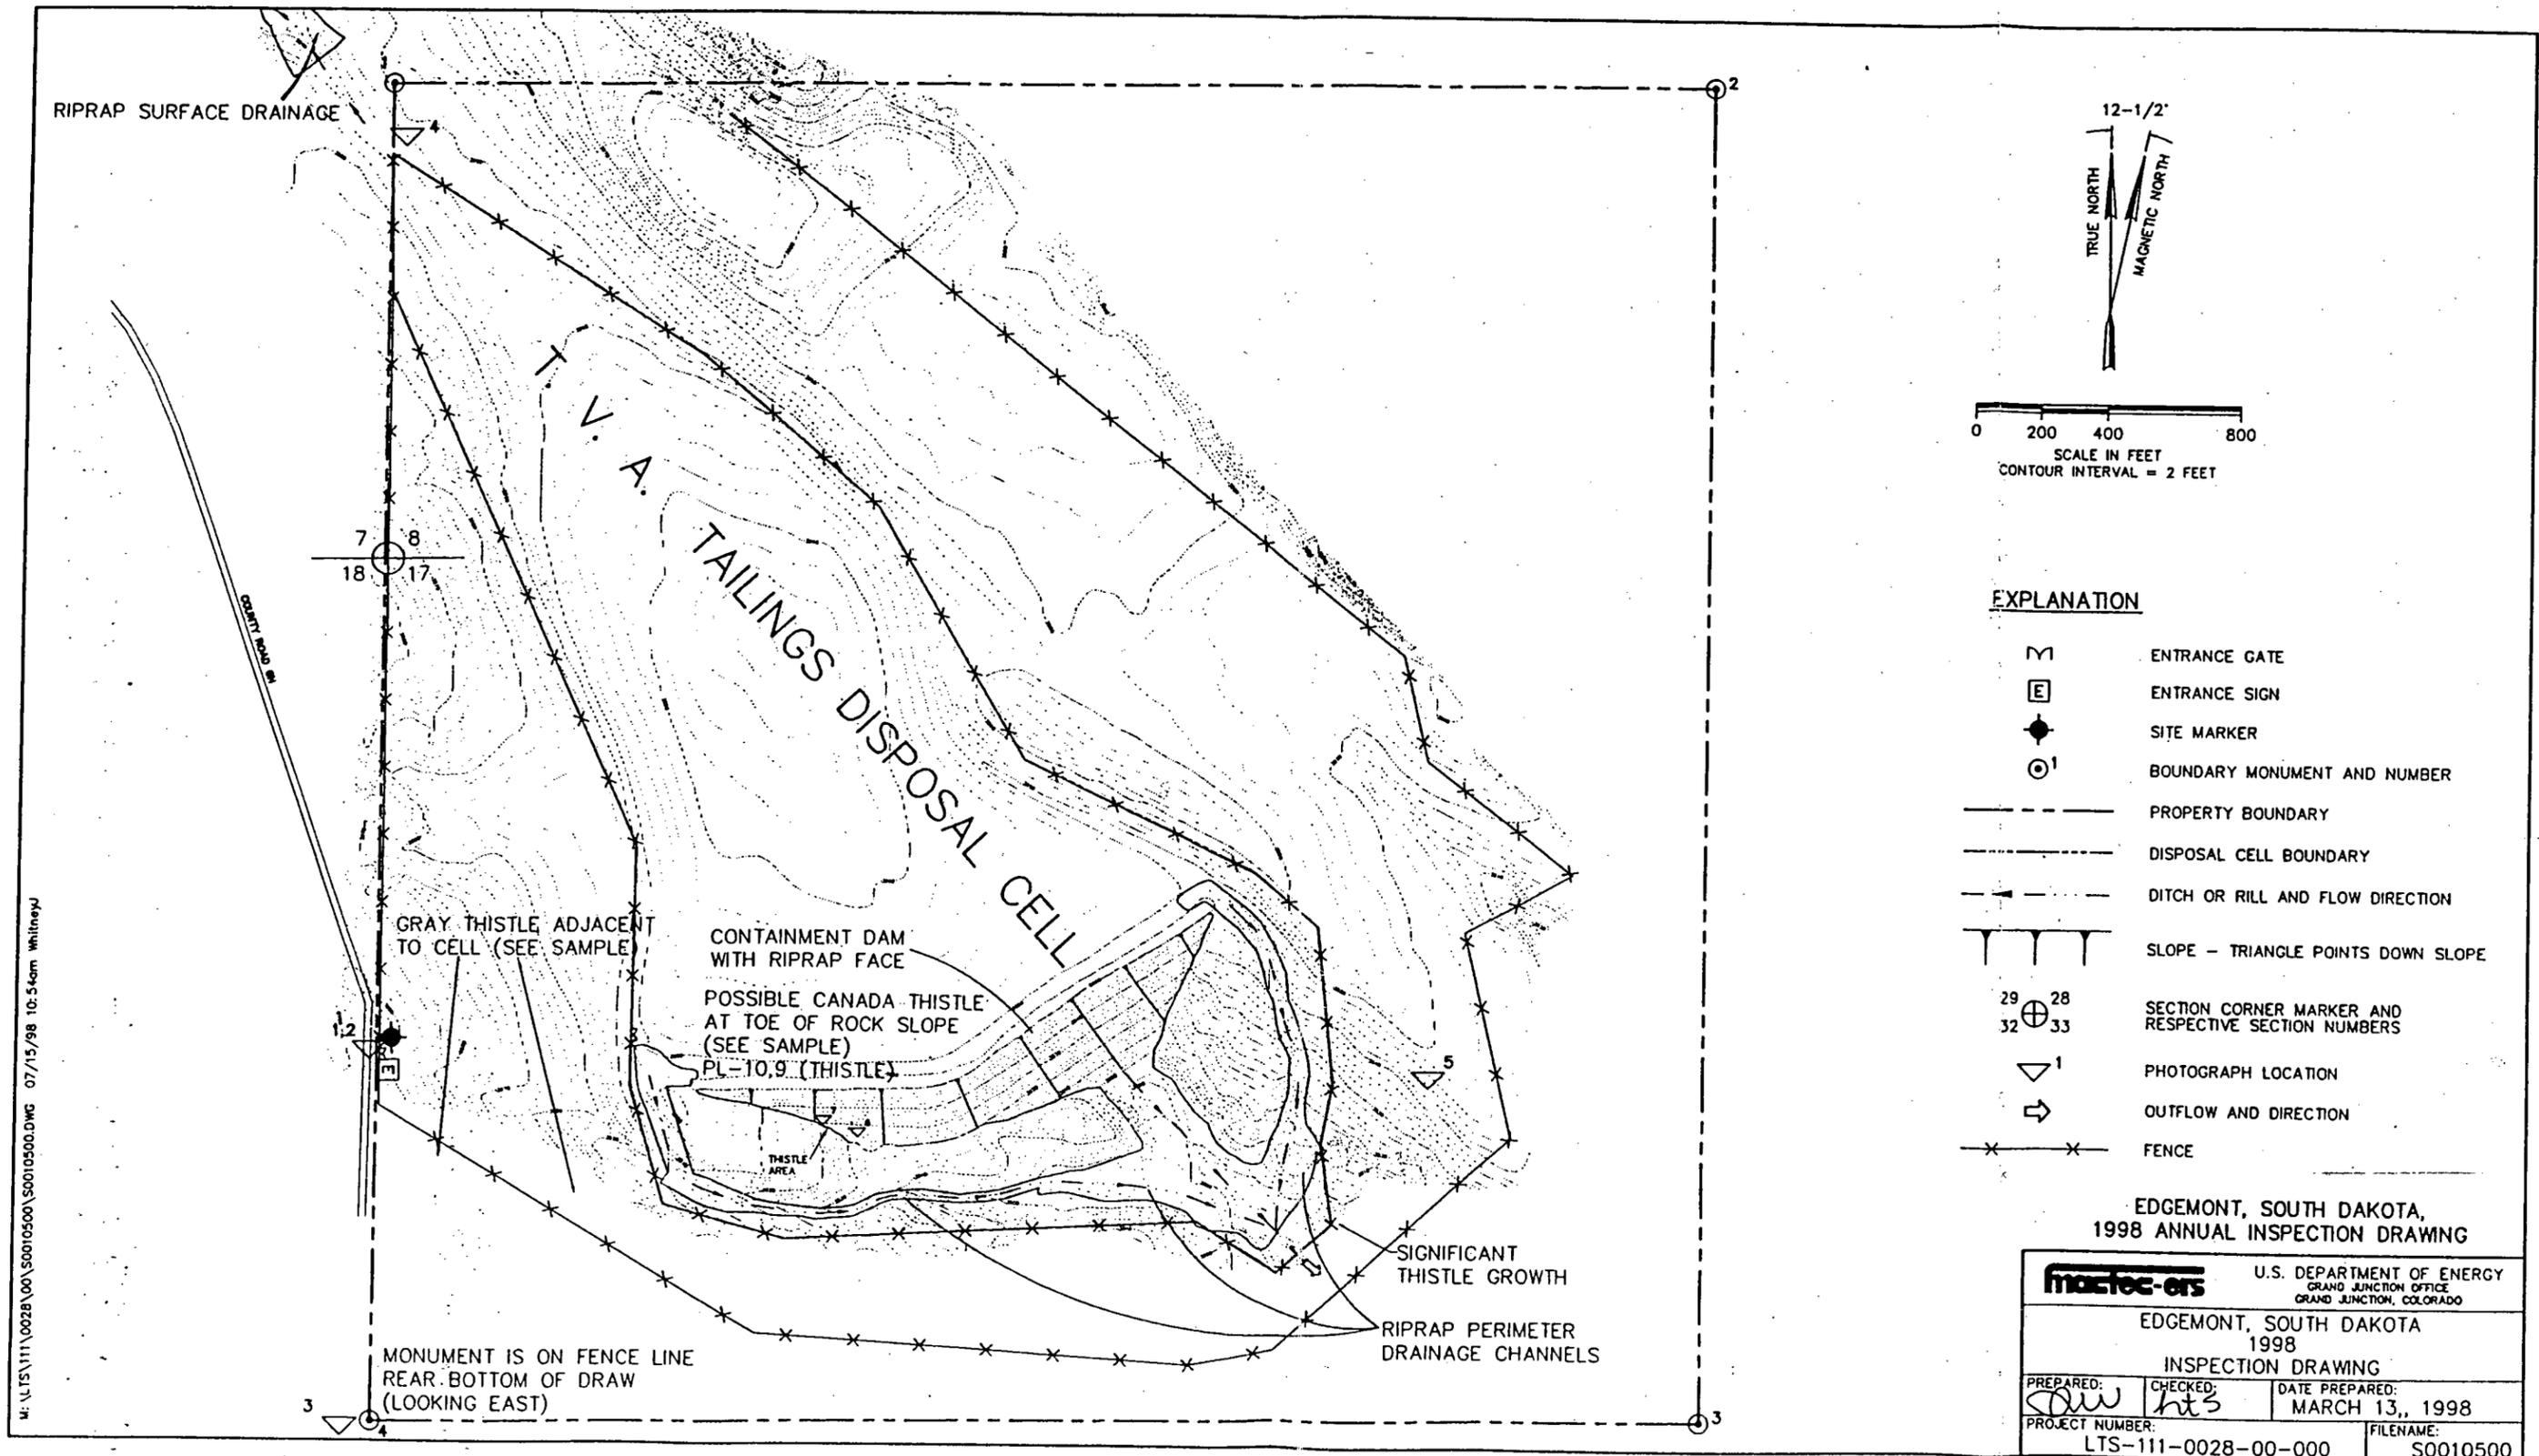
Edgemont, South Dakota, 1998 Inspection Drawing
